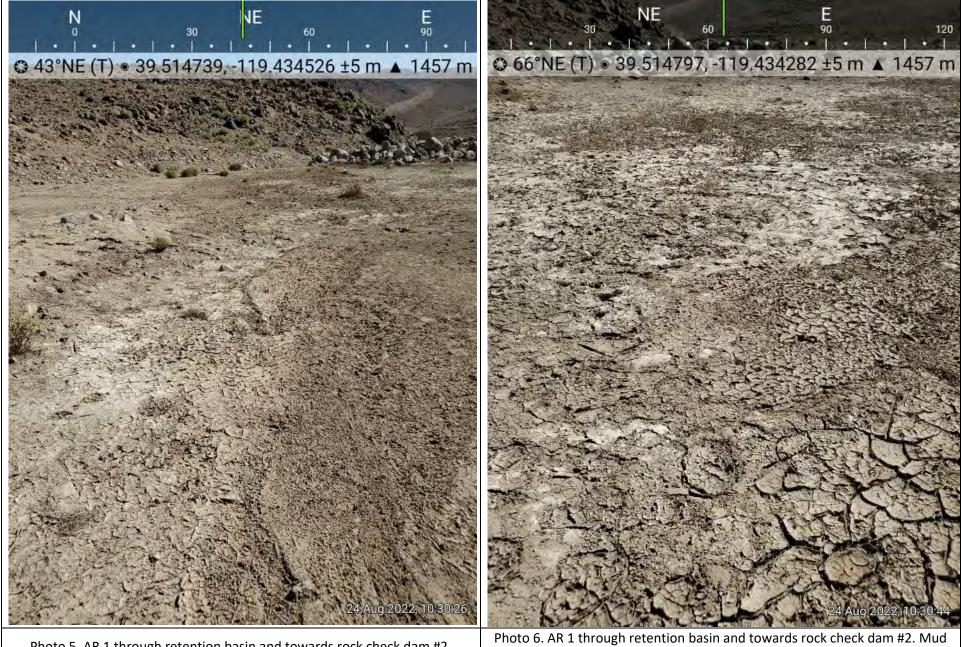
AR 1 through retention basin and towards rock check dam #2.
